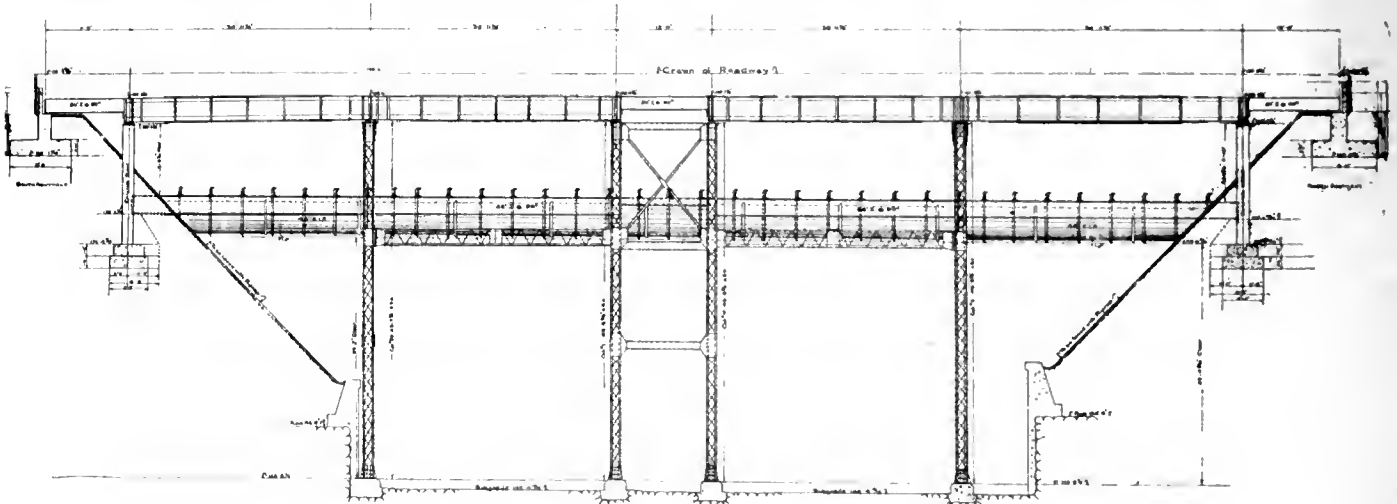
Dorchester street crosses open cut by viaduct of plate girder spans on steel columns.
